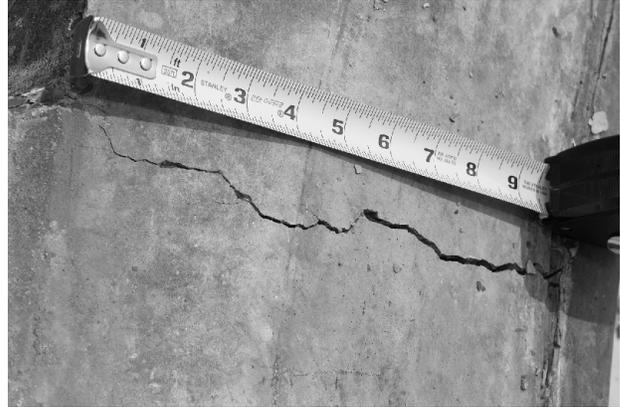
Worst case crack in the concrete monolith shield.
